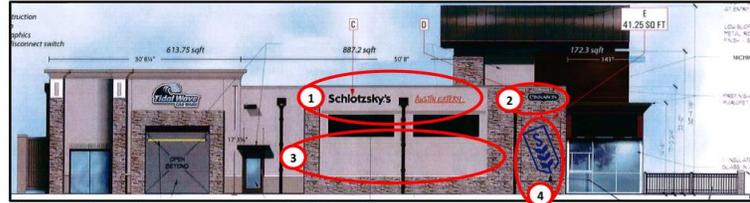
North Elevation—REVISED Requested wall signage (May 2019)
